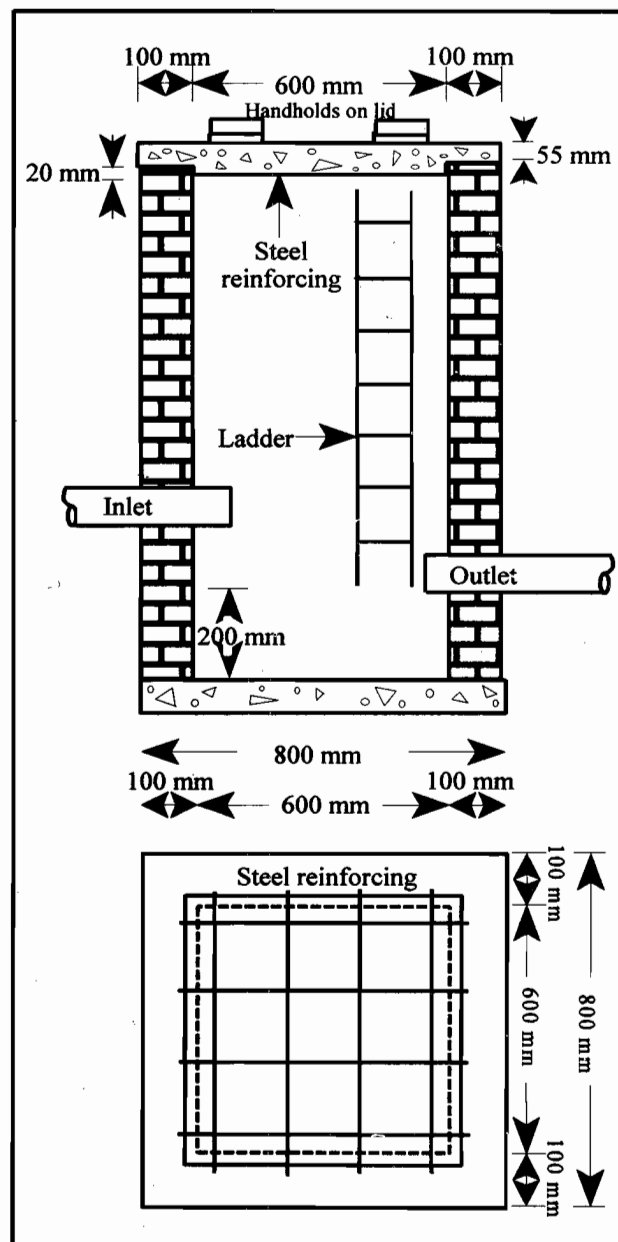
Cross section of a typical manhole. They can also be constructed circular in plan
